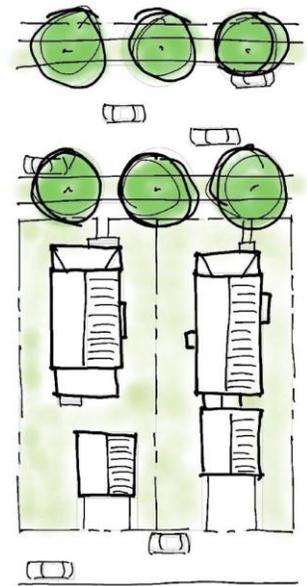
Single-Family Detached Alley Loaded, Representative Architecture & Plan
